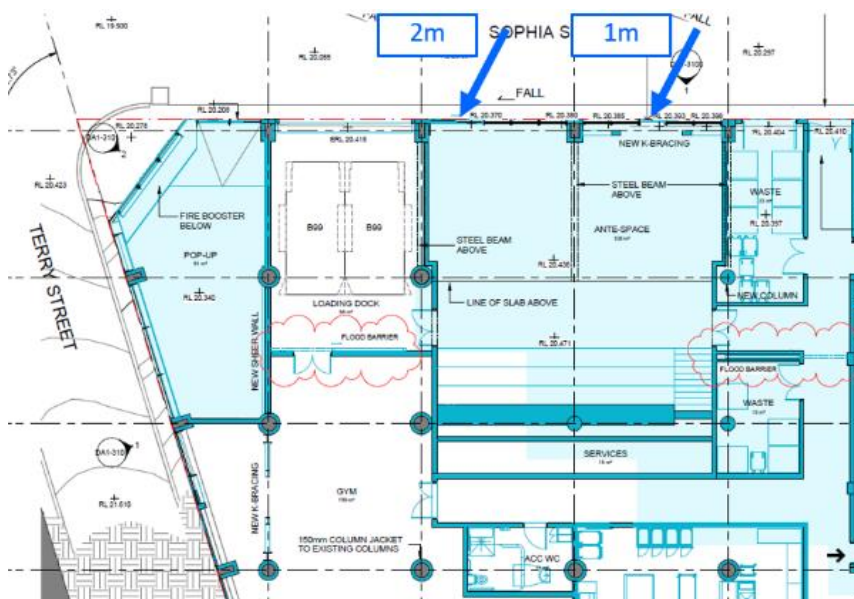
amended drawings show doors opening onto Sophia Street have been reduced to narrower apertures with a combined width of 3m.
